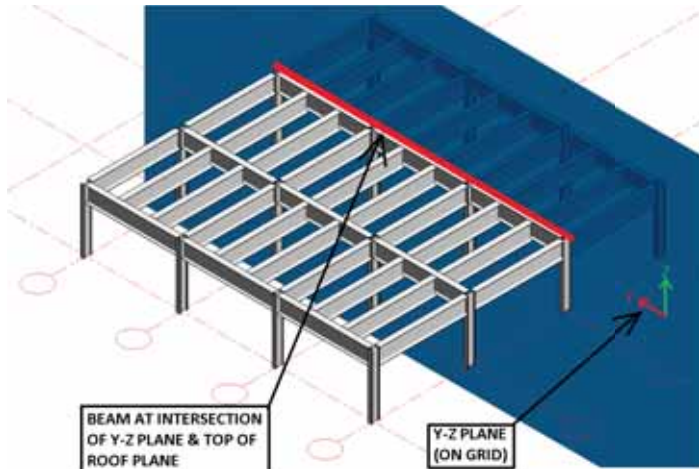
Horizontal Beam Framing at Intersection of Roof and Y-Z Plane
